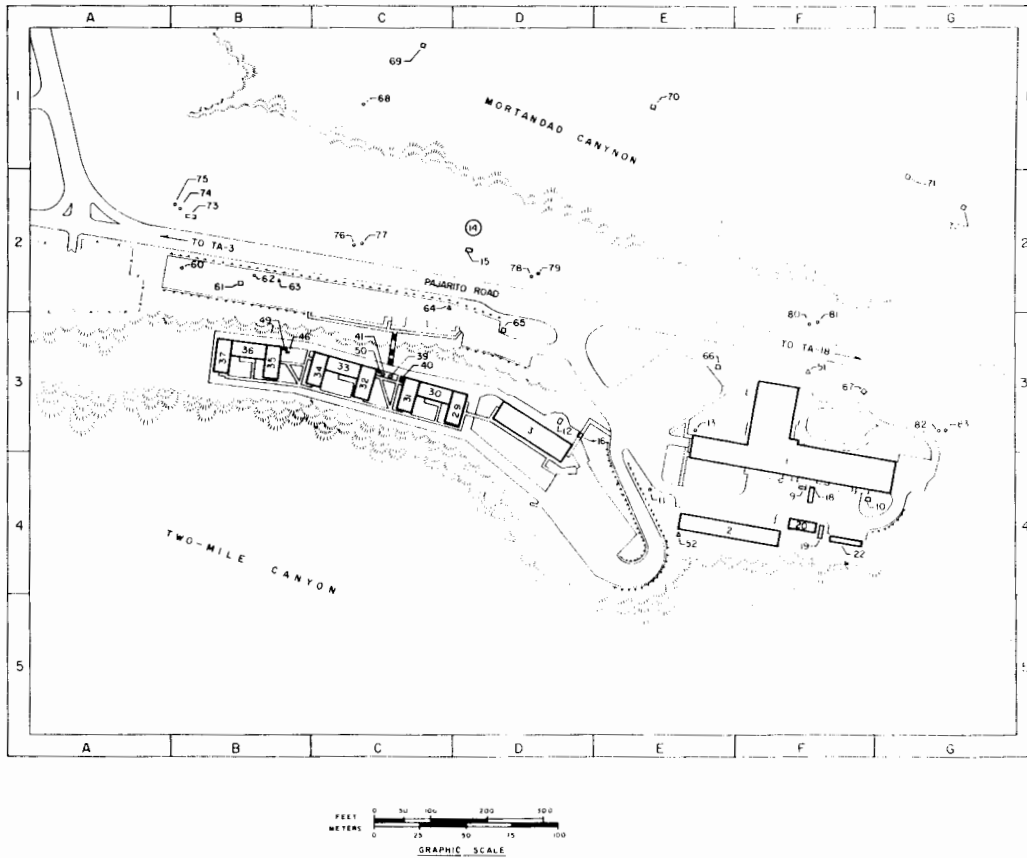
Structure Location Plan for TA-59 - OH Site
